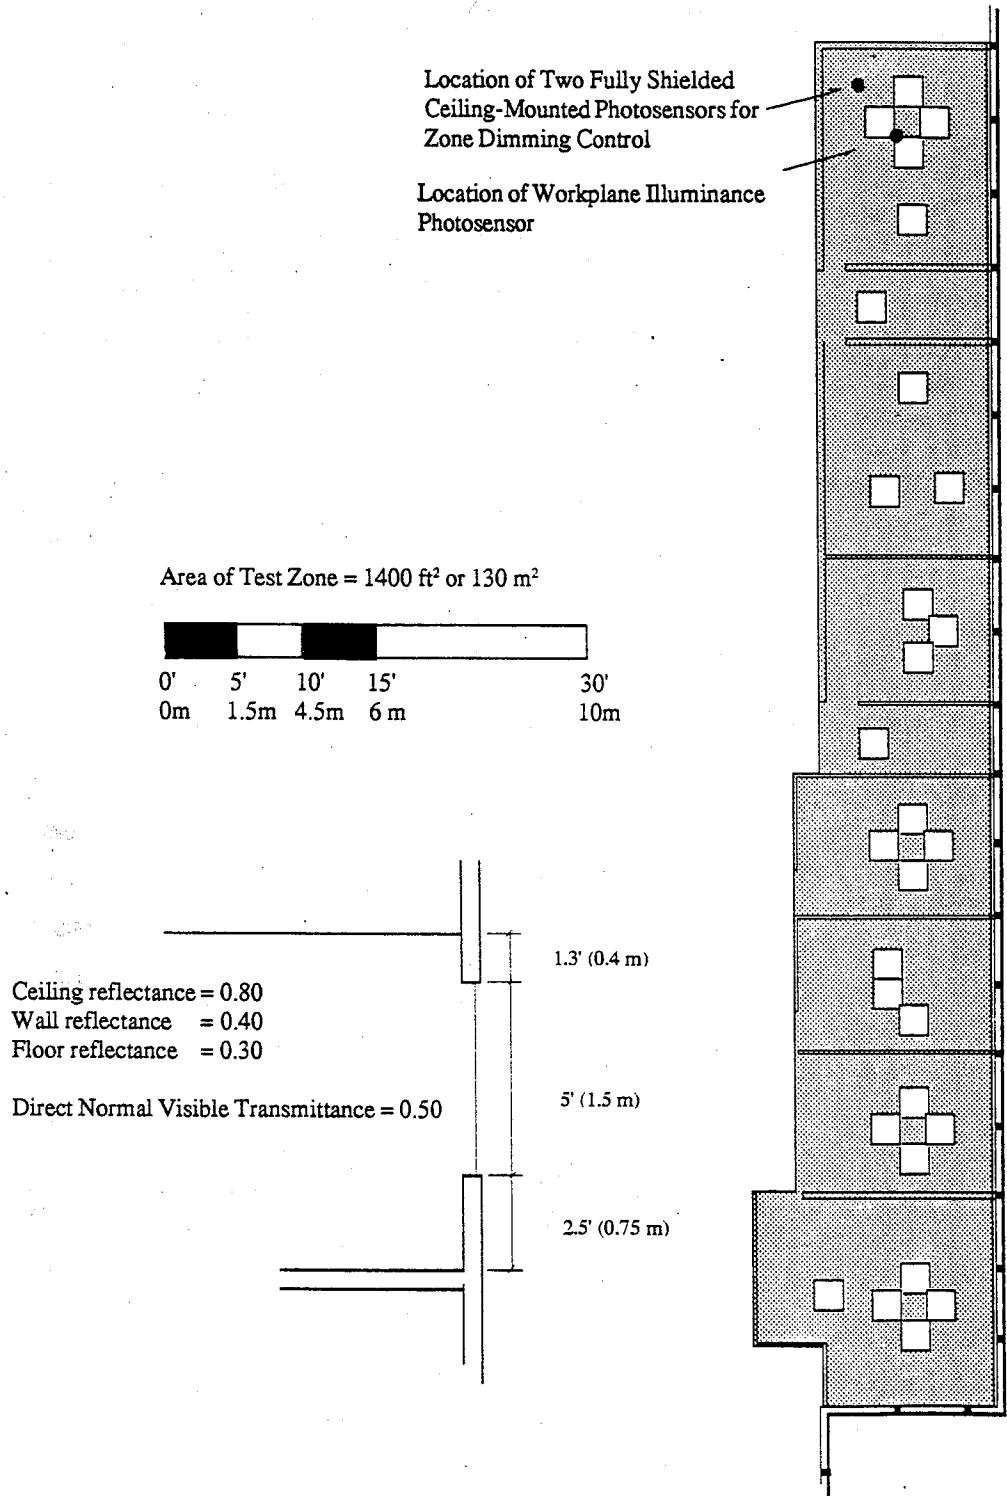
Plan and Window Wall Section of the 5th Floor East-Facing Test Zone at Building B.
